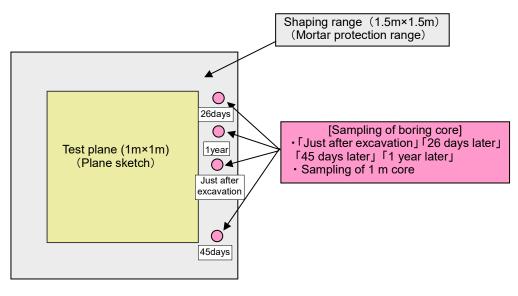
Schematic plan of test surface Plan schématique de la surface de test
